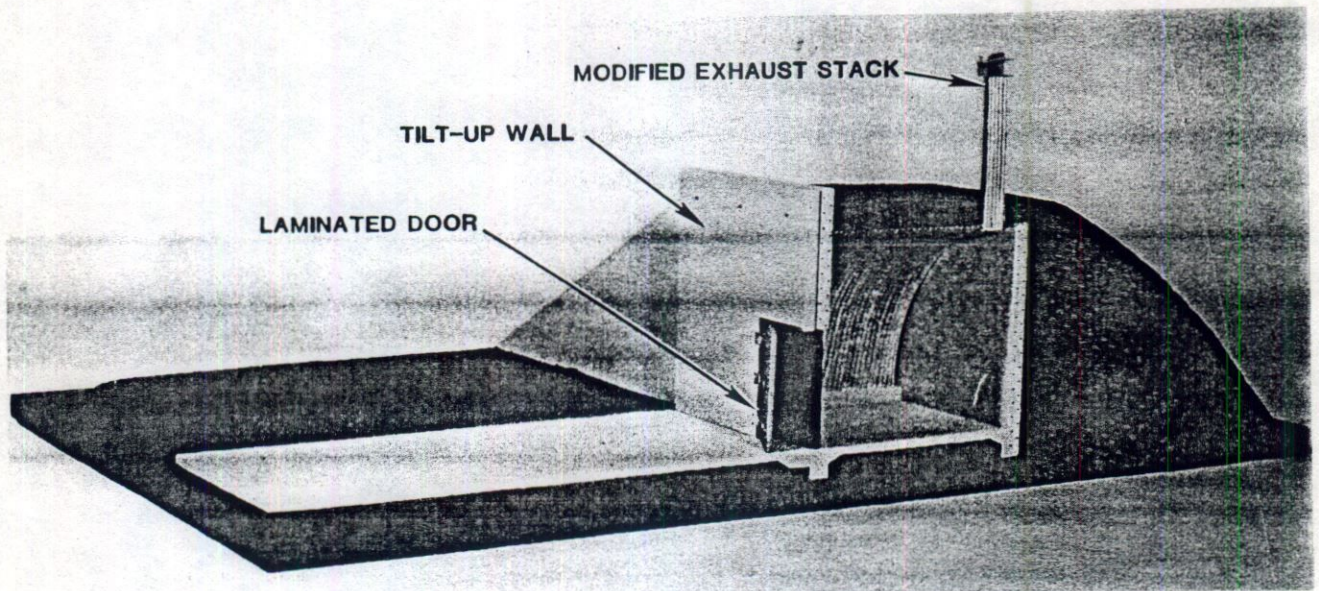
Tilt-Up Wall Addition — Igloo Model Sectioned and Foreshortened
